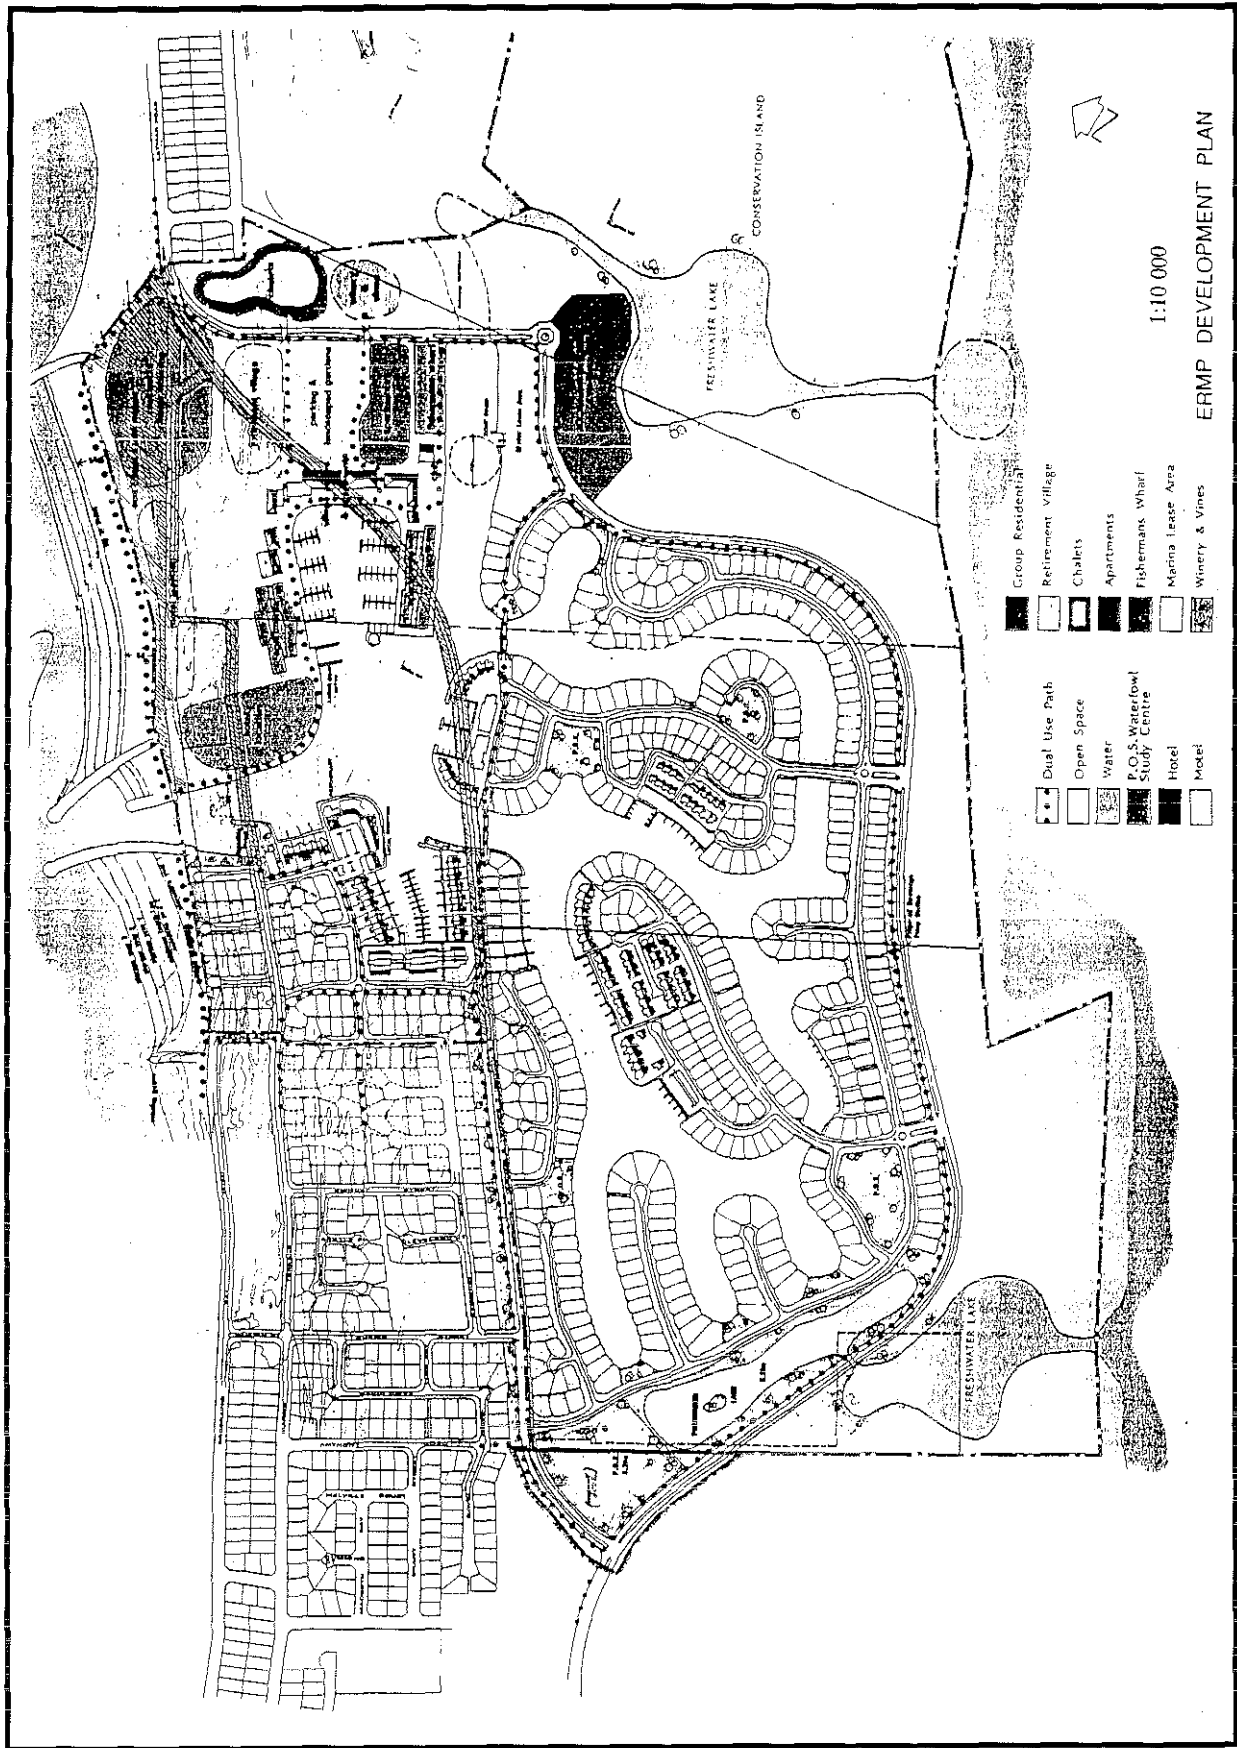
ERMP Development Plan (1989) (LeProvost Dames & Moore, 1995).
